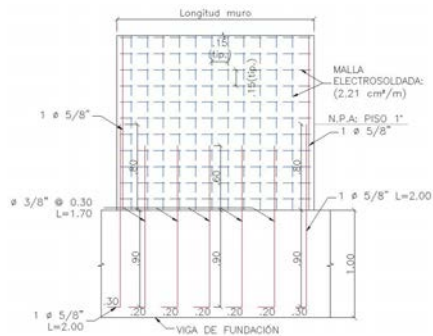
Detail showing anchorage of the shear wall to the foundation beam. Seven story project. Figure courtesy of Alvaro P
